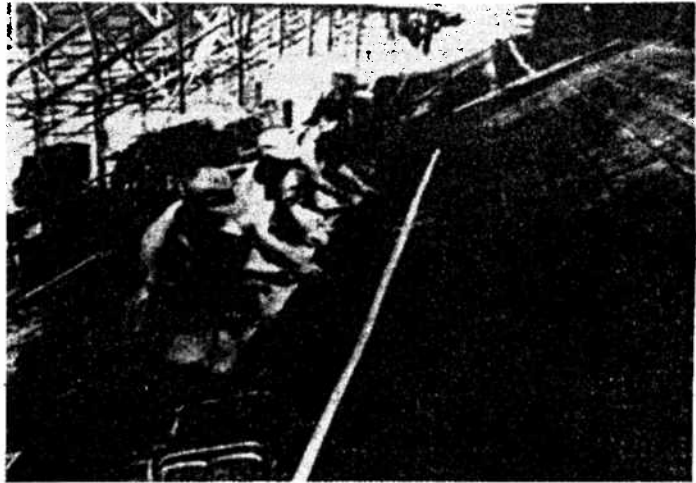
'Roof repair' work (Main Hall of Kimpusen - ji)
